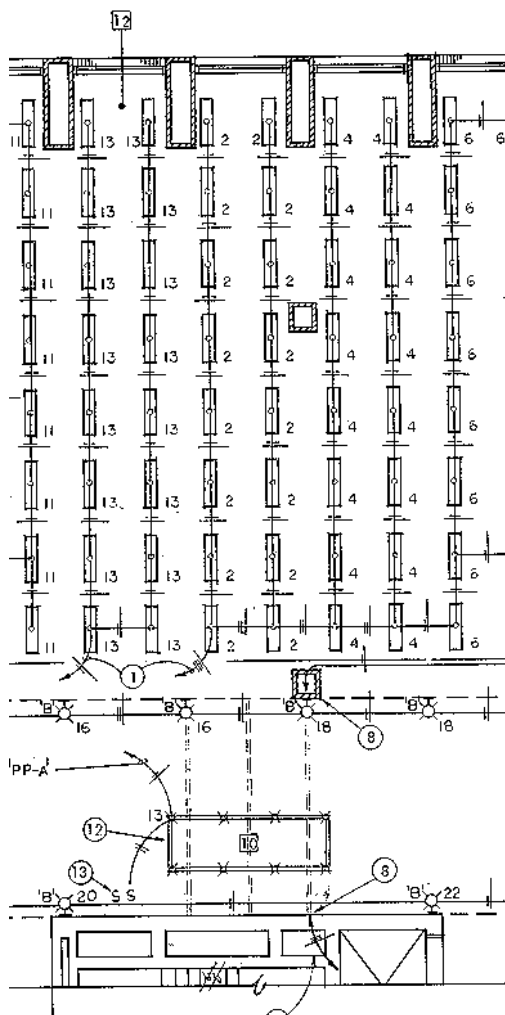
Partial reflected ceiling plan of the new addition and galleria, showing patterning of the fluorescent, globe and track lighting fixtures..
